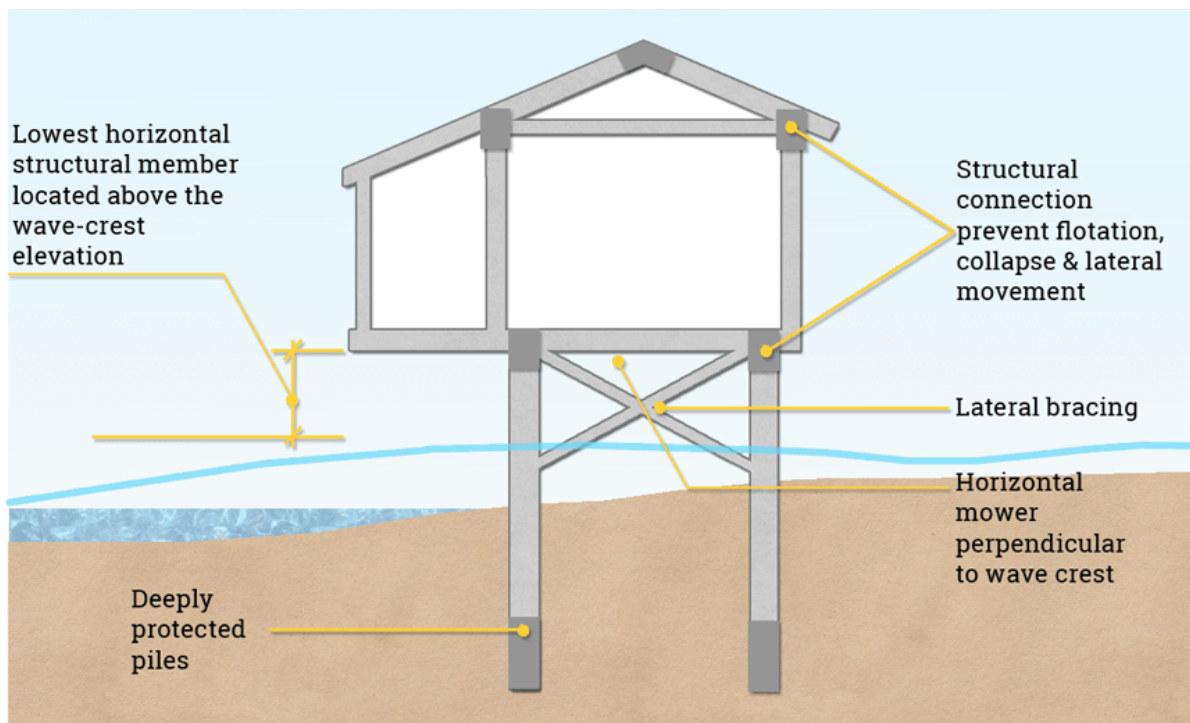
Image showing introduction of bracings between columns (credit: andhitapradipta.github.io)
